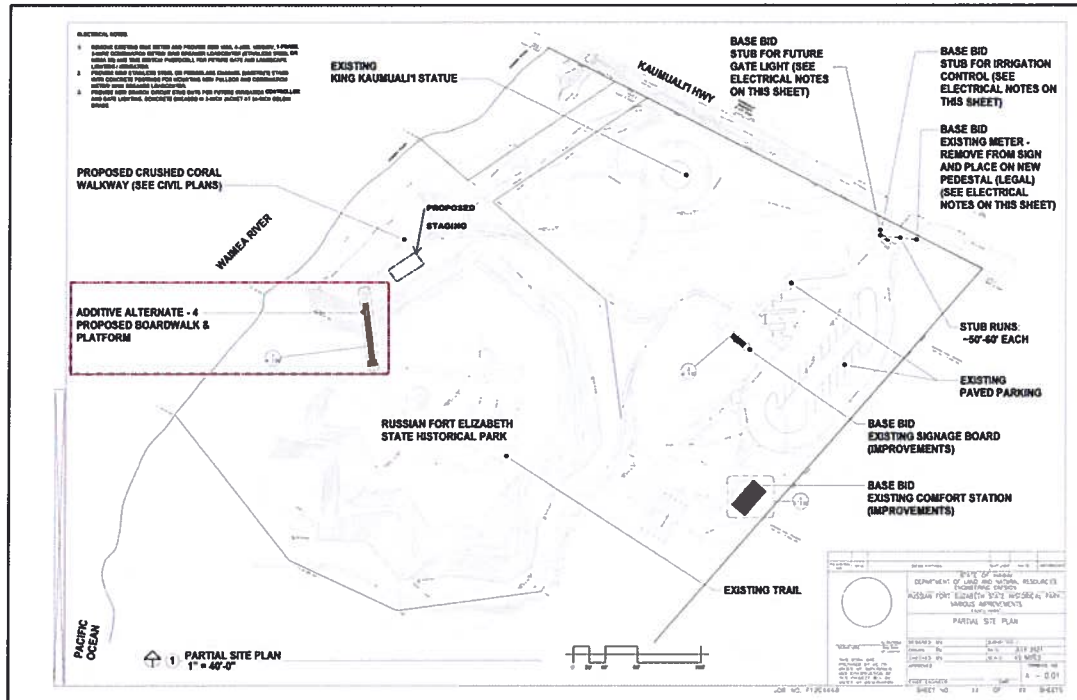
Site Plan showing the proposed boardwalk and viewing platform at the fort entry. Other improvements are proposed on existing park facilities including the parking lot, comfort station, interpretive sign kisok, and coral path. Landscaping improvements are proposed to the north and east of the fort. Subject to minor modifications in final drawings for construction.
